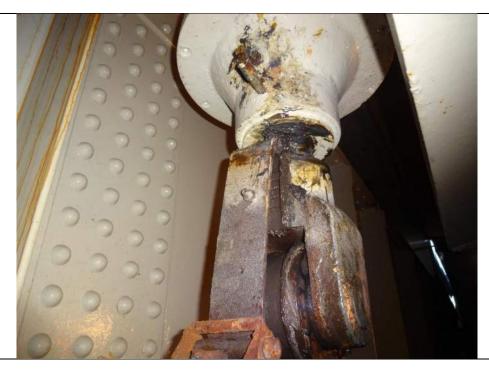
[SW Seated Buffer] - Seated buffer exhibits minor surface corrosion and corrosion on back lever that is meant to extend rod.
